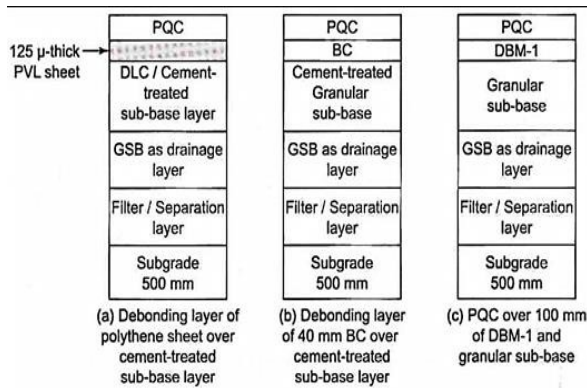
Different Cross-sections of Concrete Rigid Pavement Layers (Source-IRC: 58).
